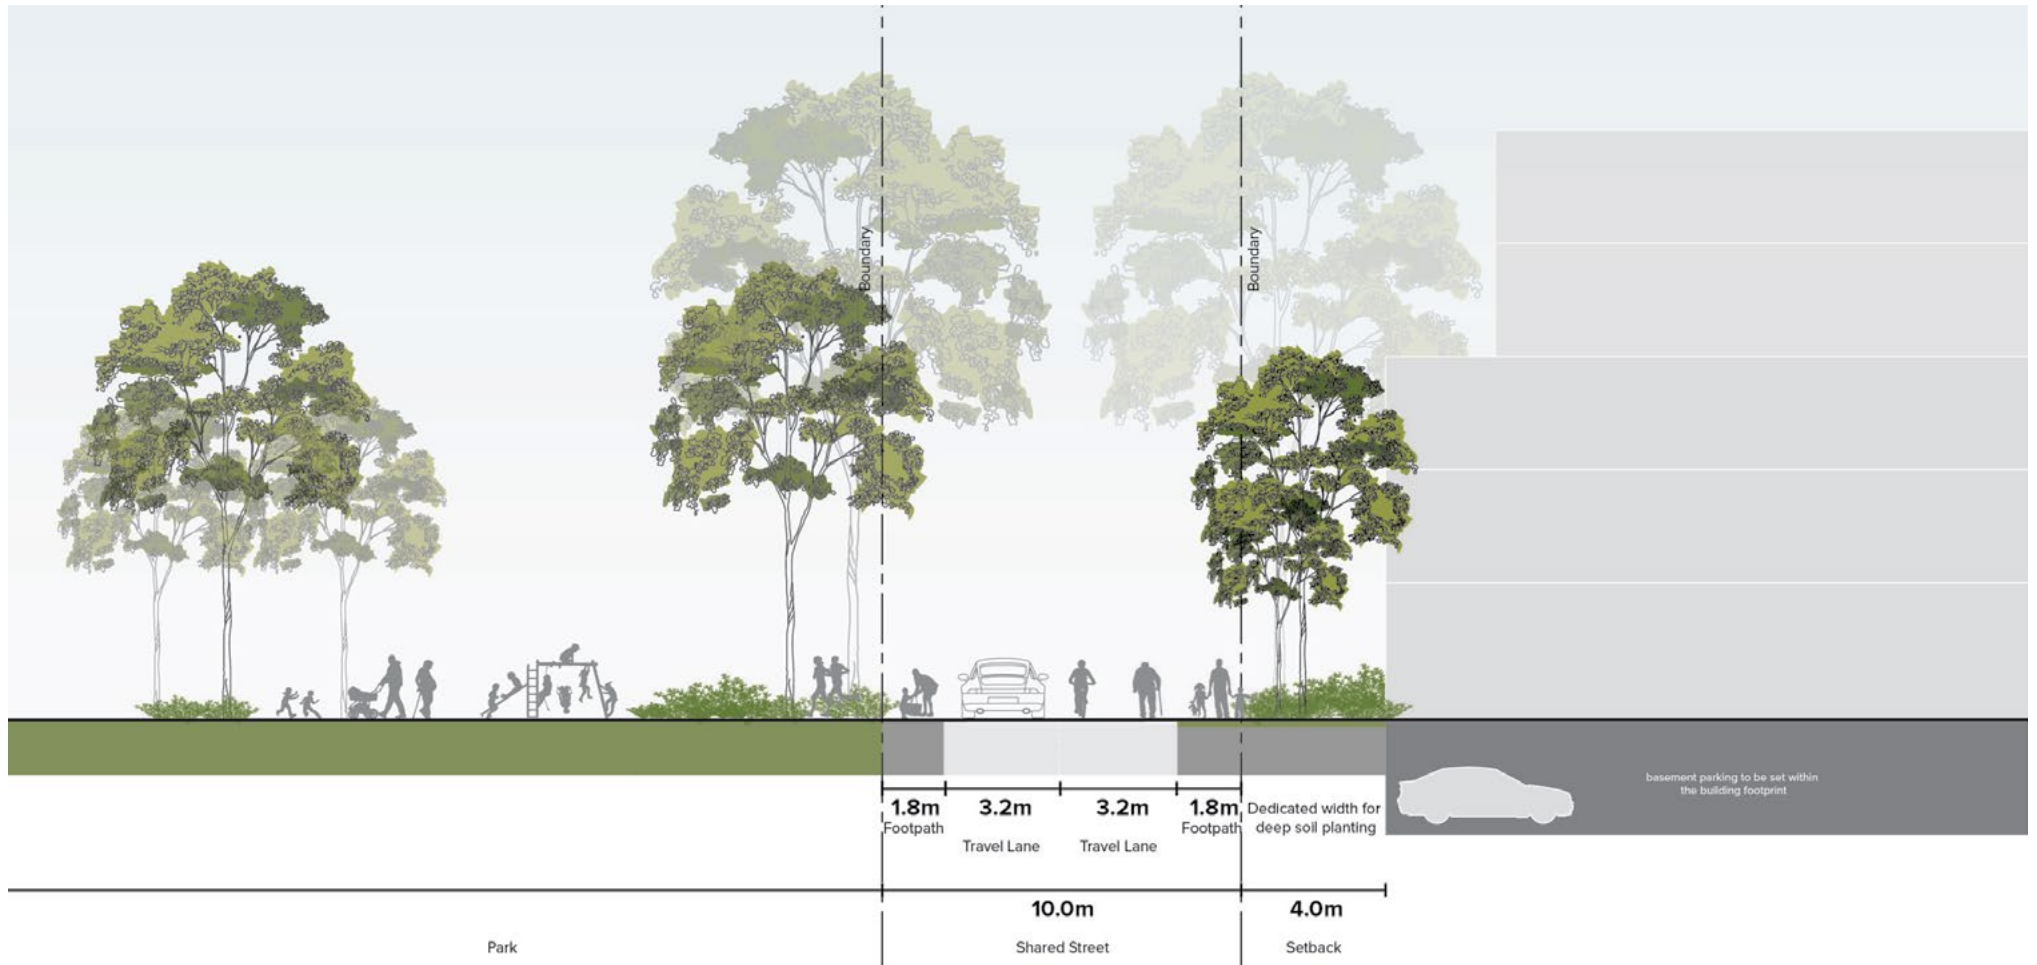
Typical shared street/mews with park interface – indicative street section. Credit: Hatch RobertsDay.
